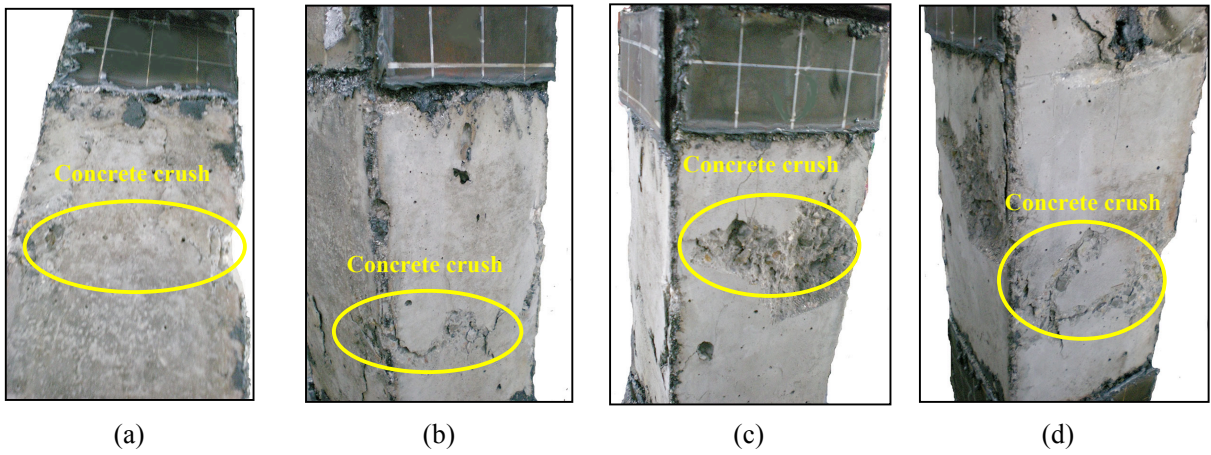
Concrete failure mode of the S5 specimen
